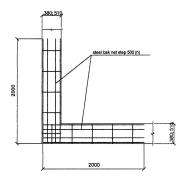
C: Horizontal Wall Section Showing Corner Reinforcement
